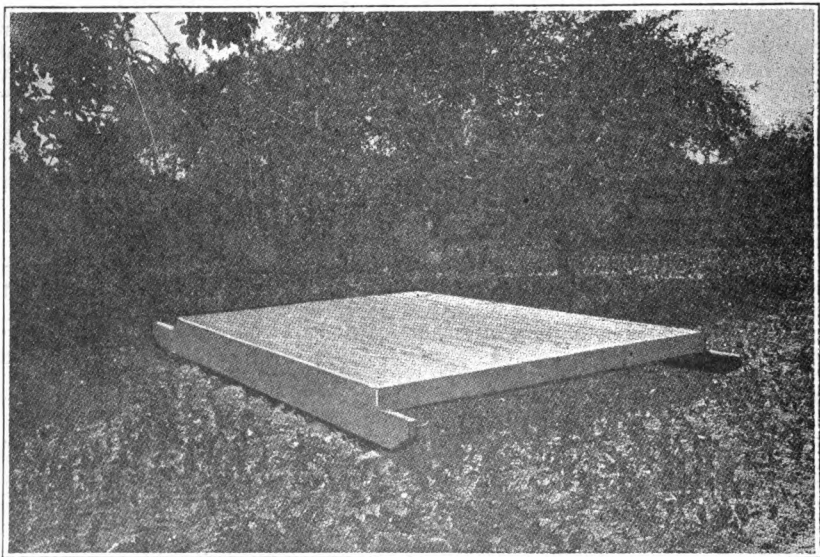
The floor is securely nailed to the joists, and this then makes a good foundation for your colony house. A double floor may be laid if you expect to use the house for brooding young chicks in winter.
